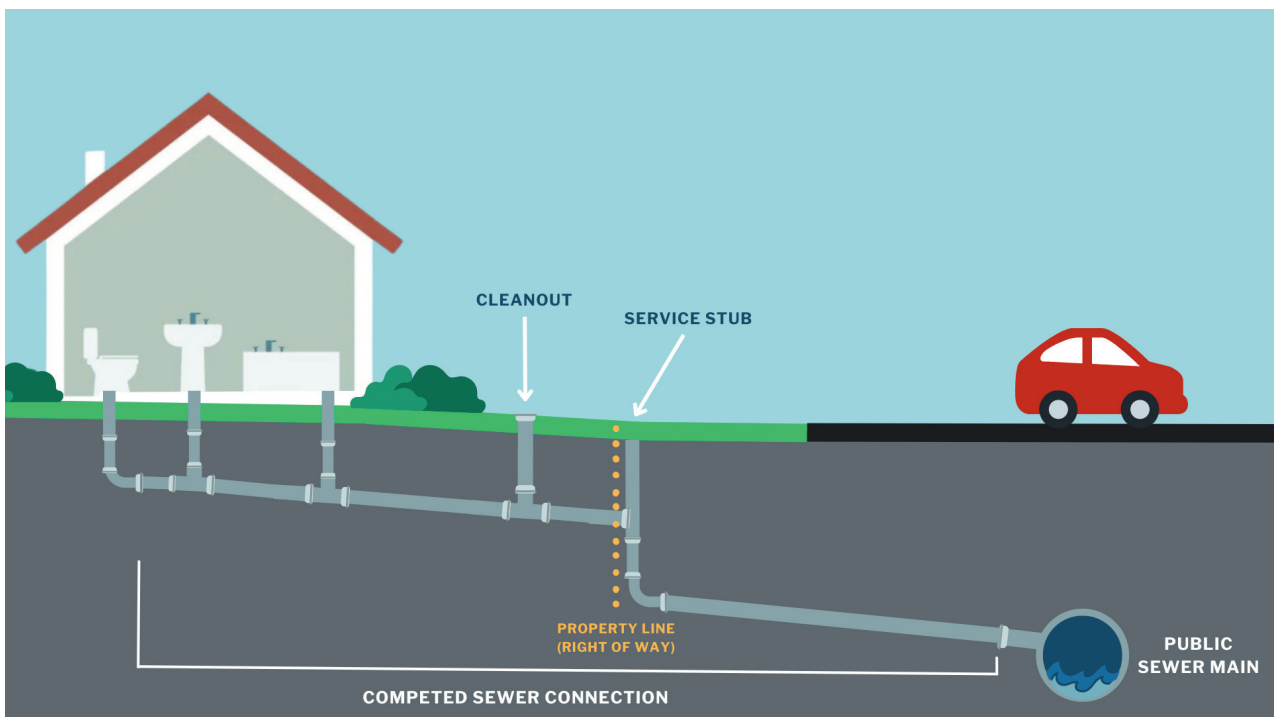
SAMPLE COMPLETED SEWER CONNECTION
